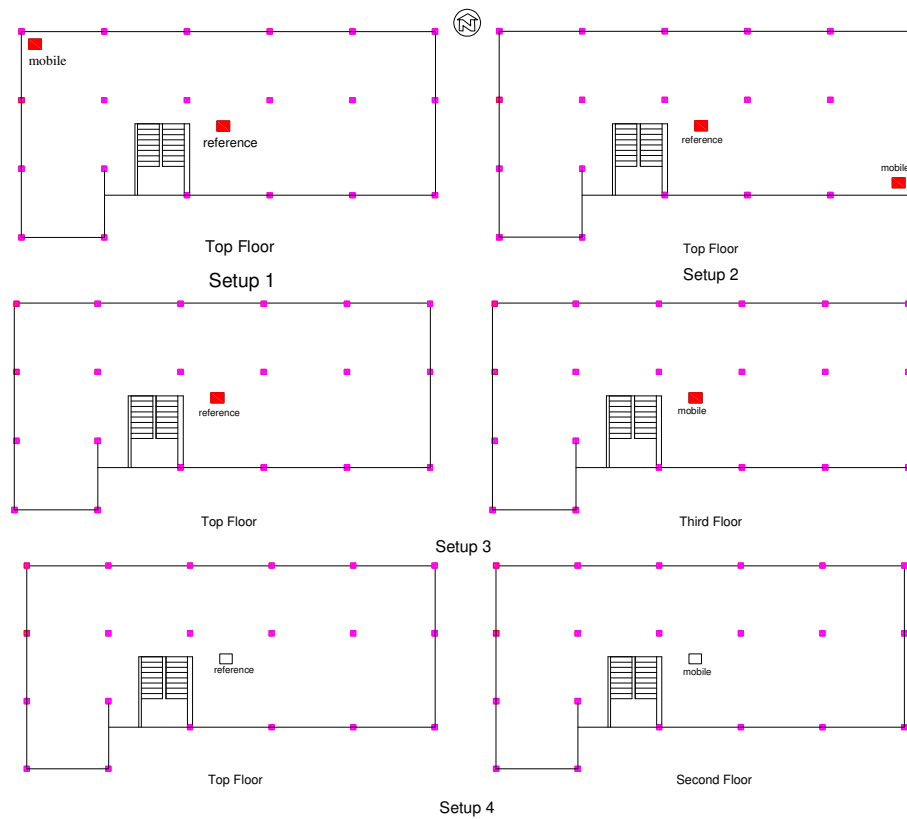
Ambient vibration tests setup for the MRT2 building - schematic layout (not scaled)
